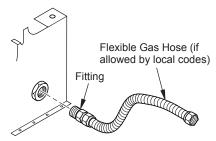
Attaching Flexible Gas Hose to Heater (Remote-Ready Models Only)
